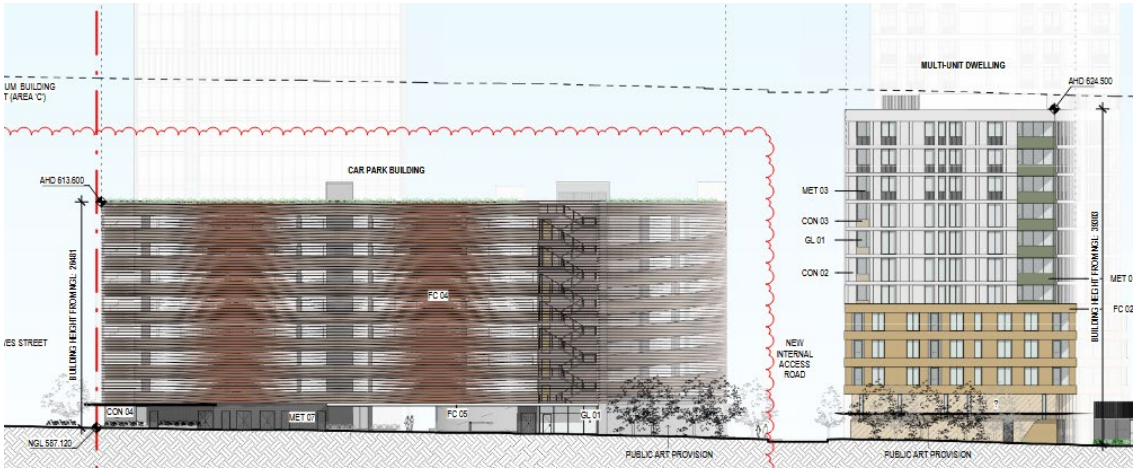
Bowes Street South Elevation, Drawing DA2003
